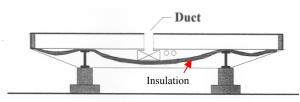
Insulation on bottom of floor cavity – floor joists running width of mobile home
